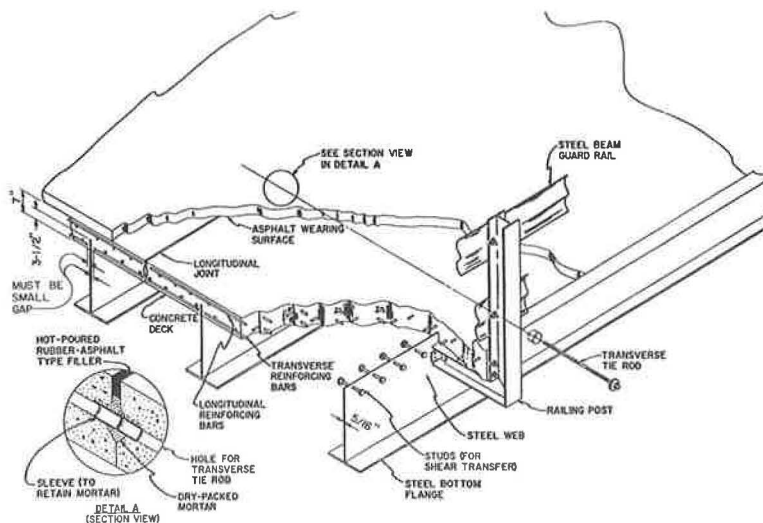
Prefabricated composite highway bridge unit with inverted steel T-Beams.
